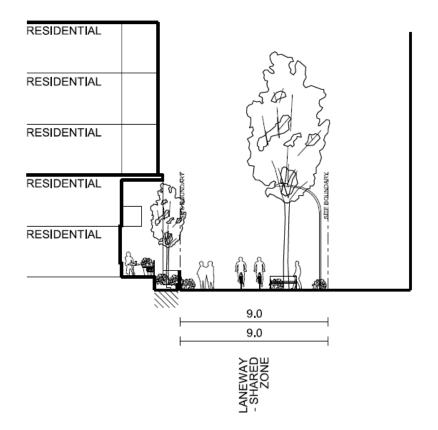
Section I – Laneway - Pedestrian and Cycle Only Typical Section – 9m
